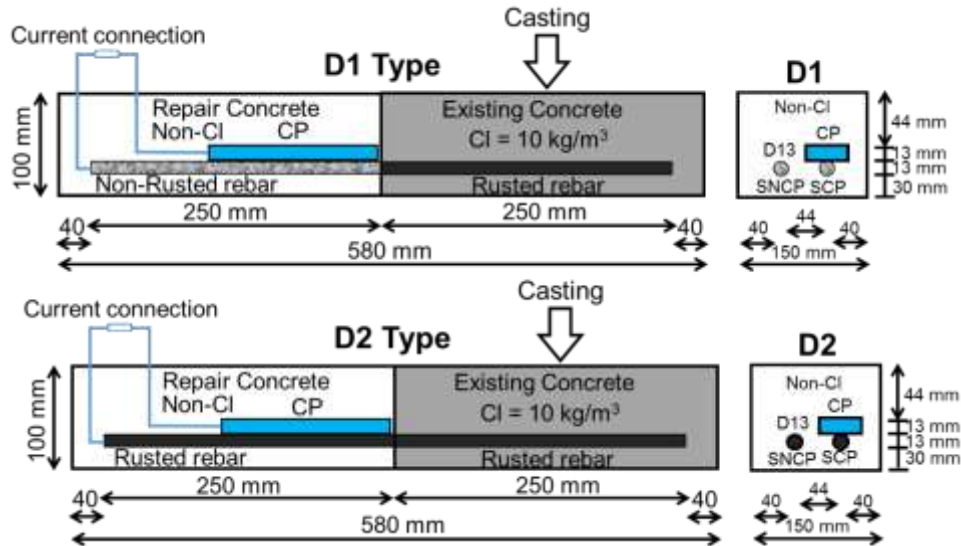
Specimen geometry with zinc sacrificial anode embedded in concrete
